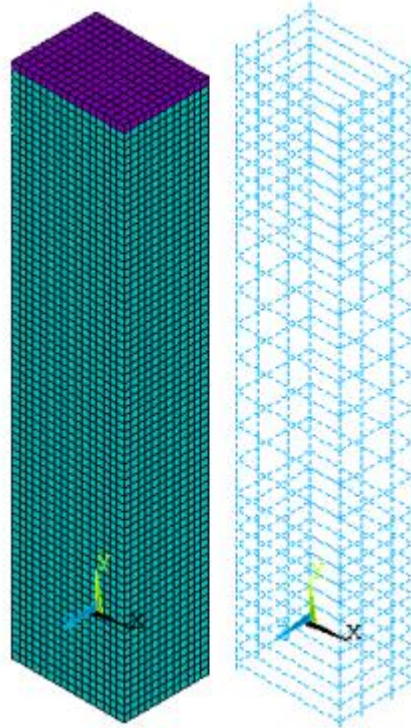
Reinforced concrete column concrete and reinforcement finite element model.
